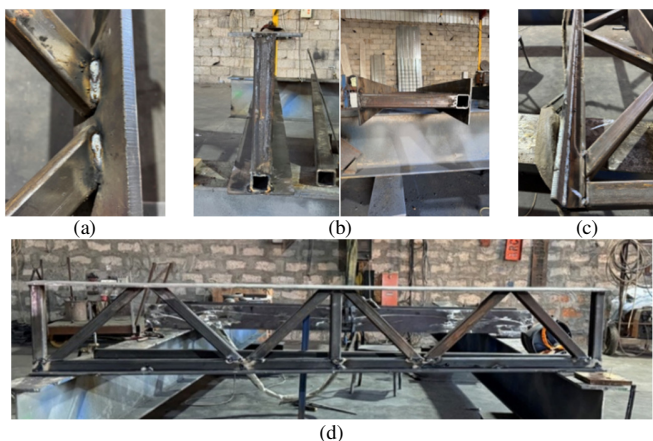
SCTG steel frame: (a) HSS diagonal member welding, (b) cross-section of the truss girder, (c) welding stage of the bottom HSS, (d) side view of the truss girder (steel plate with vertical and diagonal HSS).
